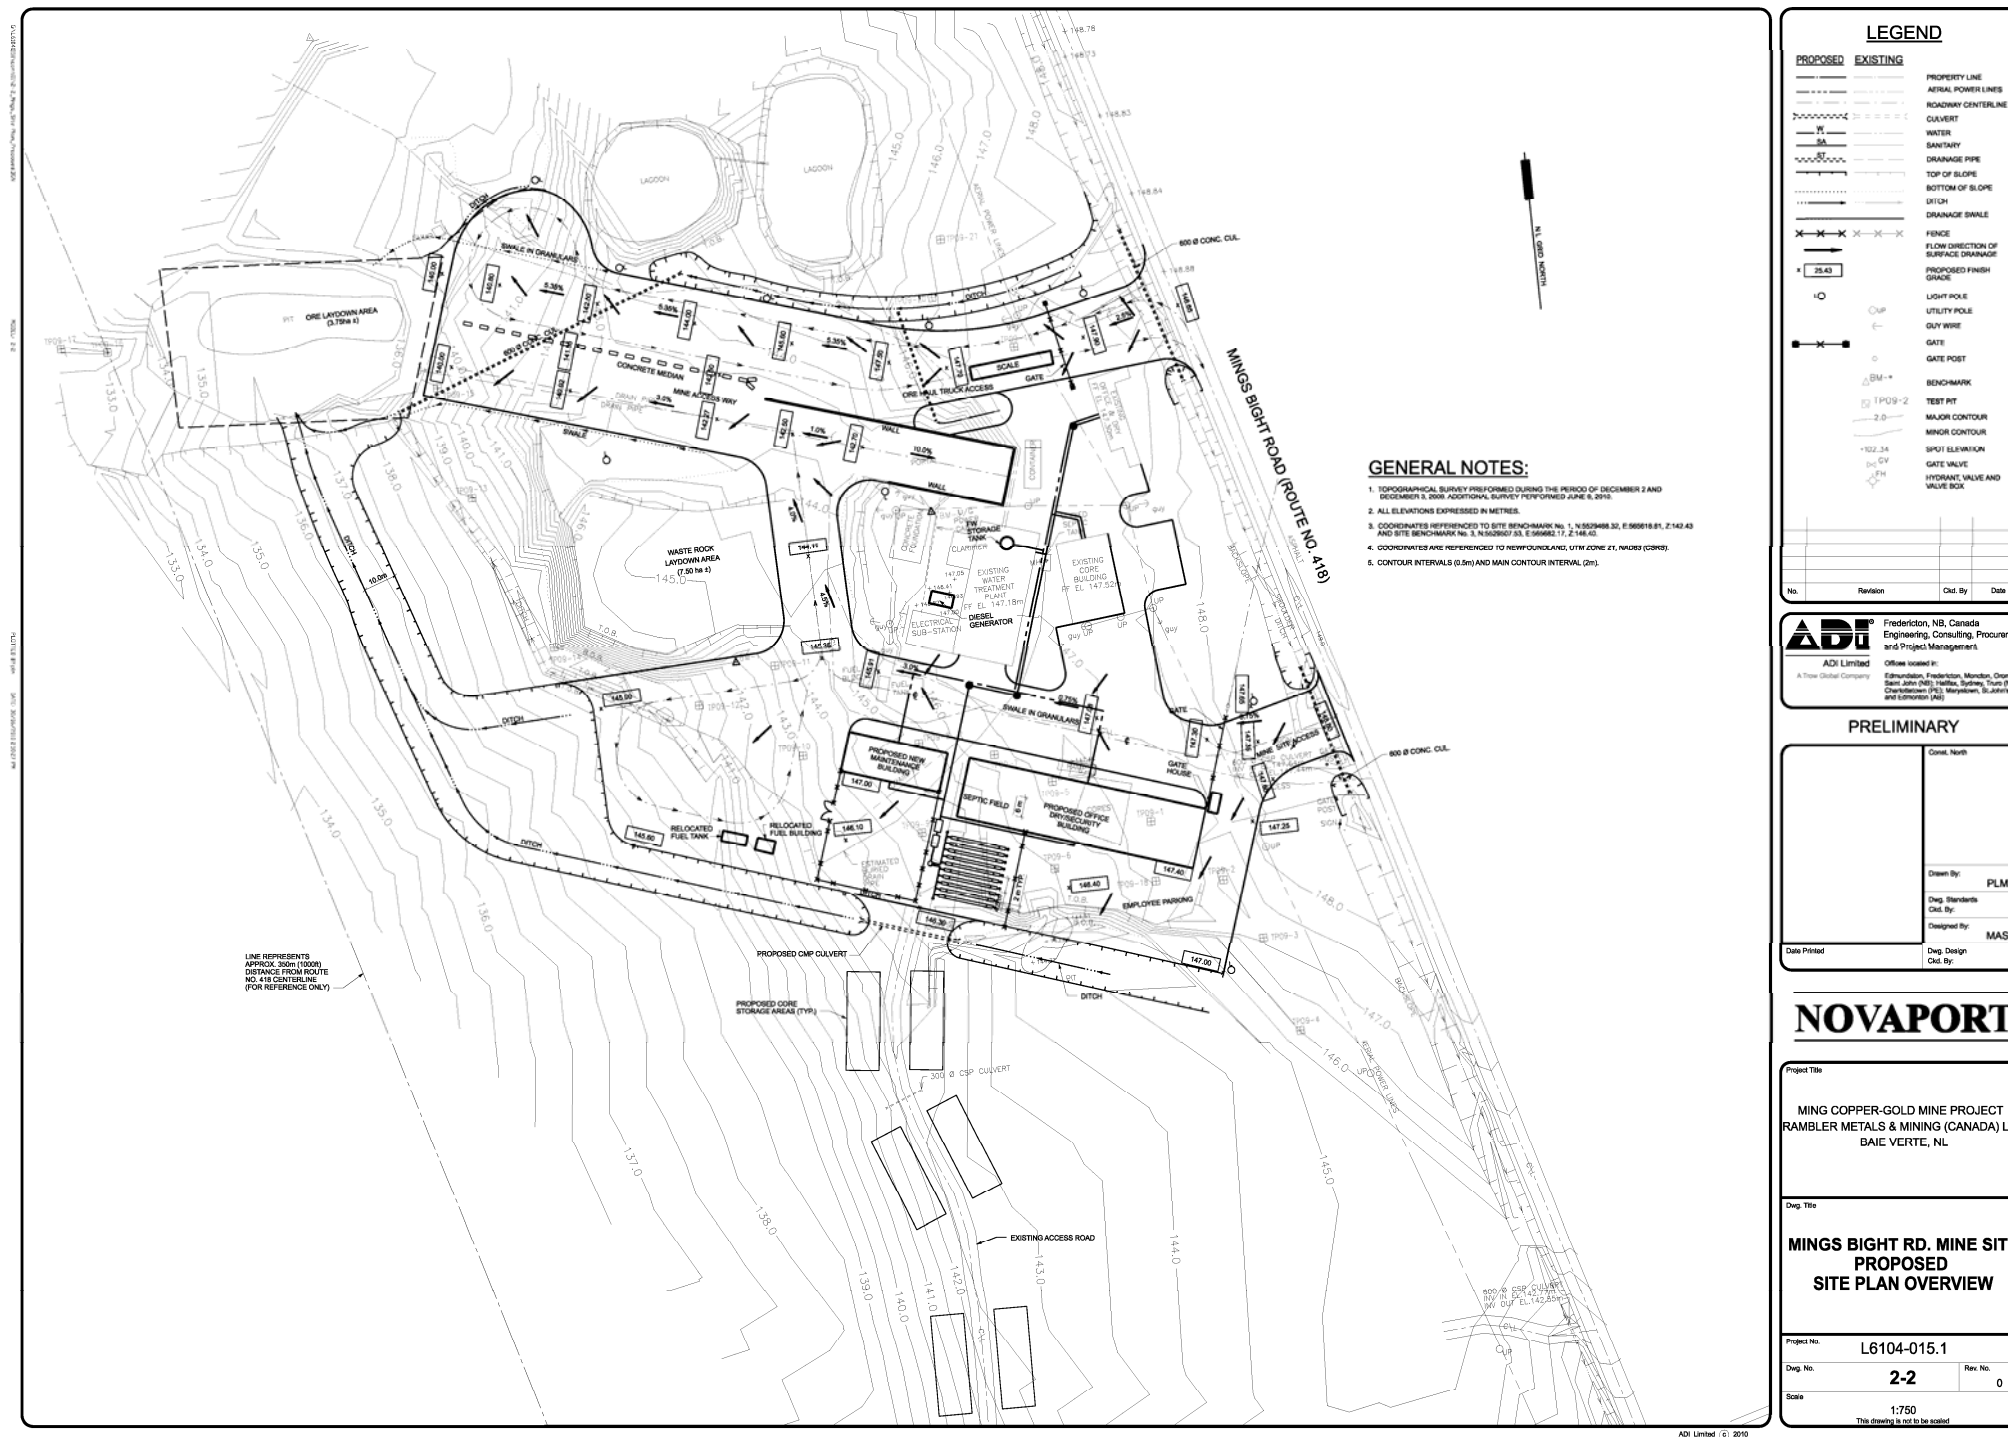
Planned Infrastructure at the Ming Mine Site
